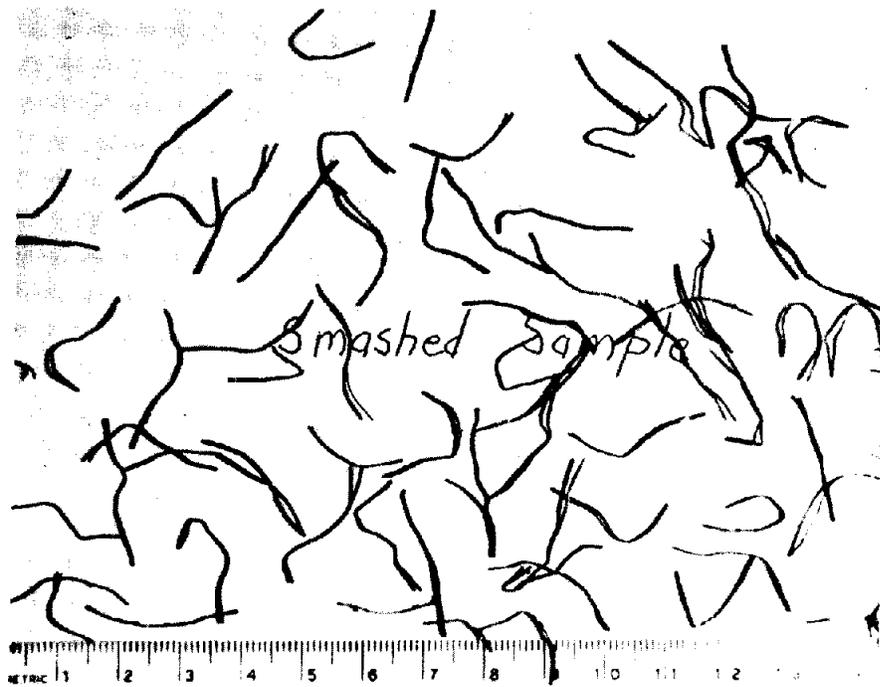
TYPICAL US FIBERS FROM PULVERIZED SAMPLES OF HARDENED SHOTCRETE
